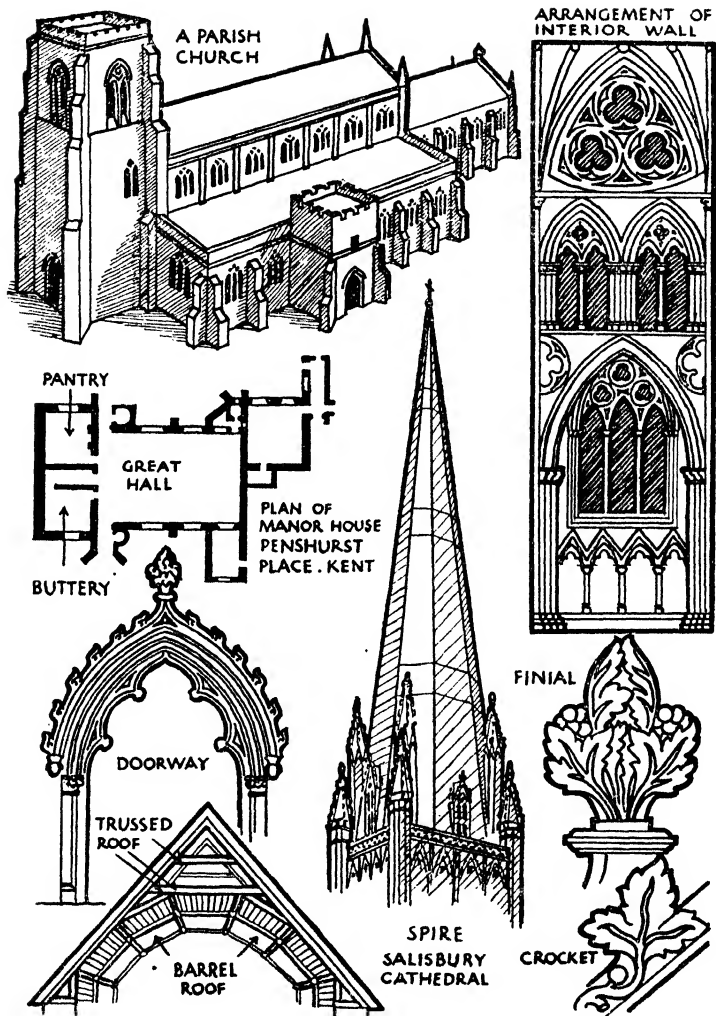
PARISH CHURCH. BUILDING DETAILS: DECORATED STYLE
